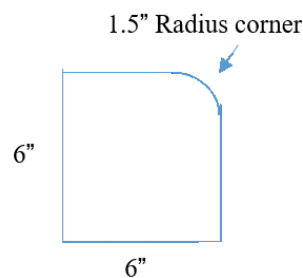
The Suggested Cross Section Shape of the Concrete Curb
